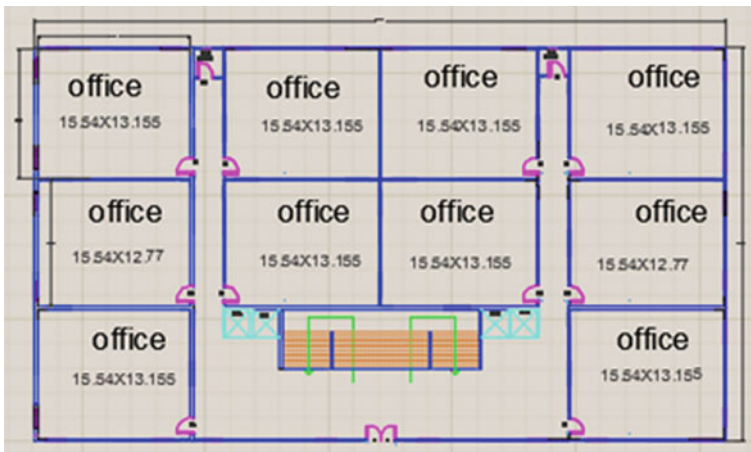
Typical floor plan of the RC building for office purpose for one to seven storeys
